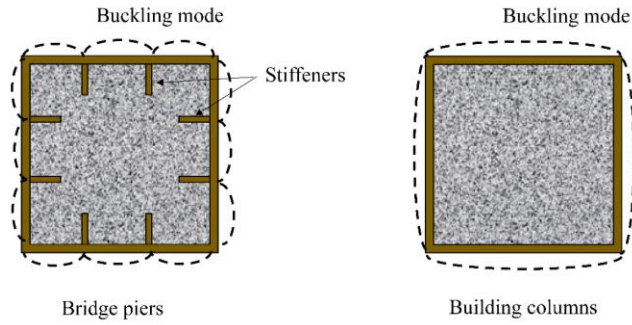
Cross section of rectangular CFT columns used in bridge and building construction
